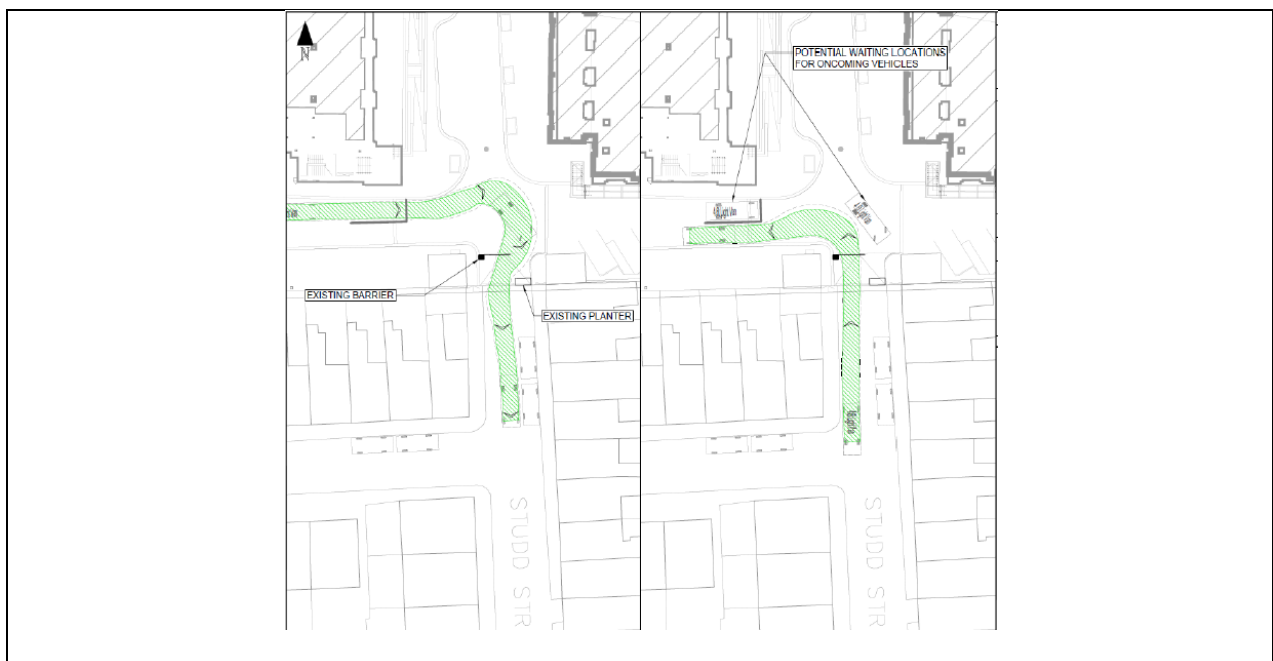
X: Proposed Studd Street access showing swept path vehicle tracking for a 4.6t light van.
